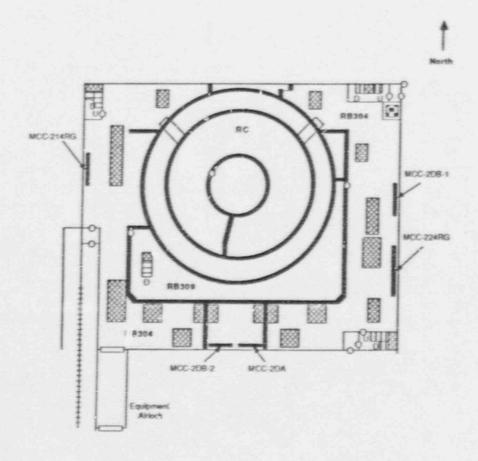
Limerick 2 Reactor Building, Elevation 217'
